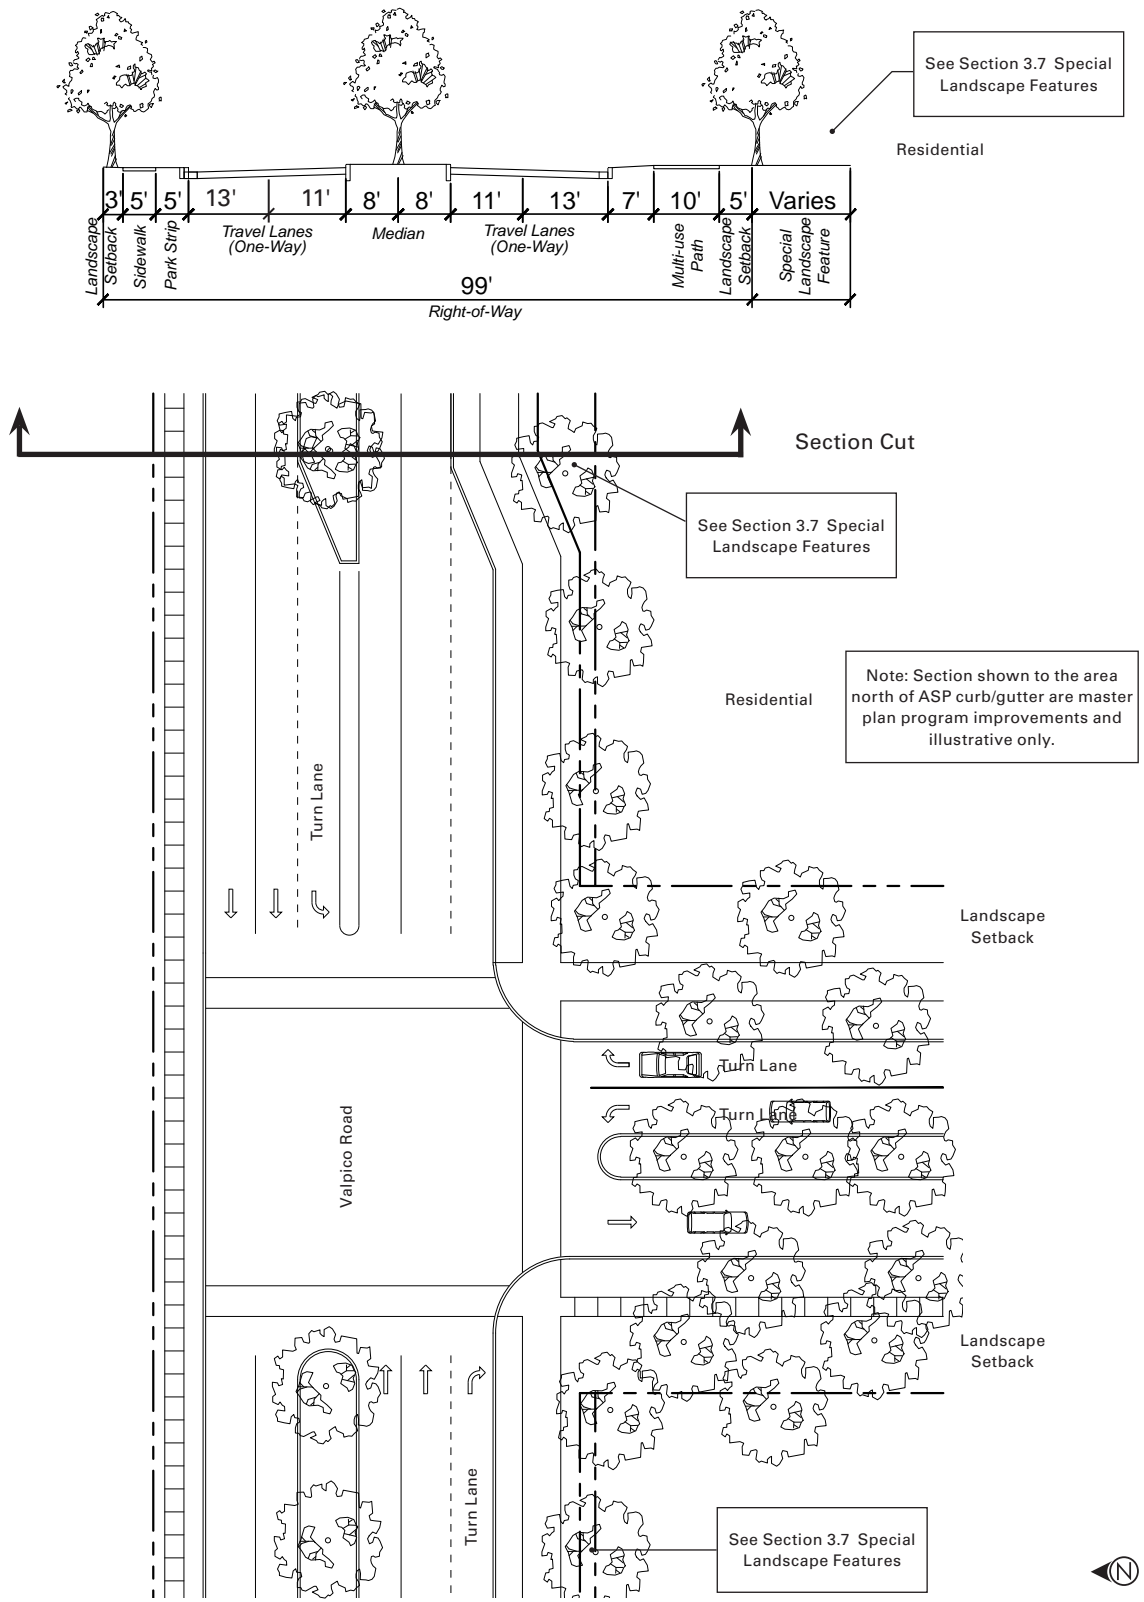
Section and Plan: Regional Arterial – Valpico Road, Designation A (Final Build-out)
